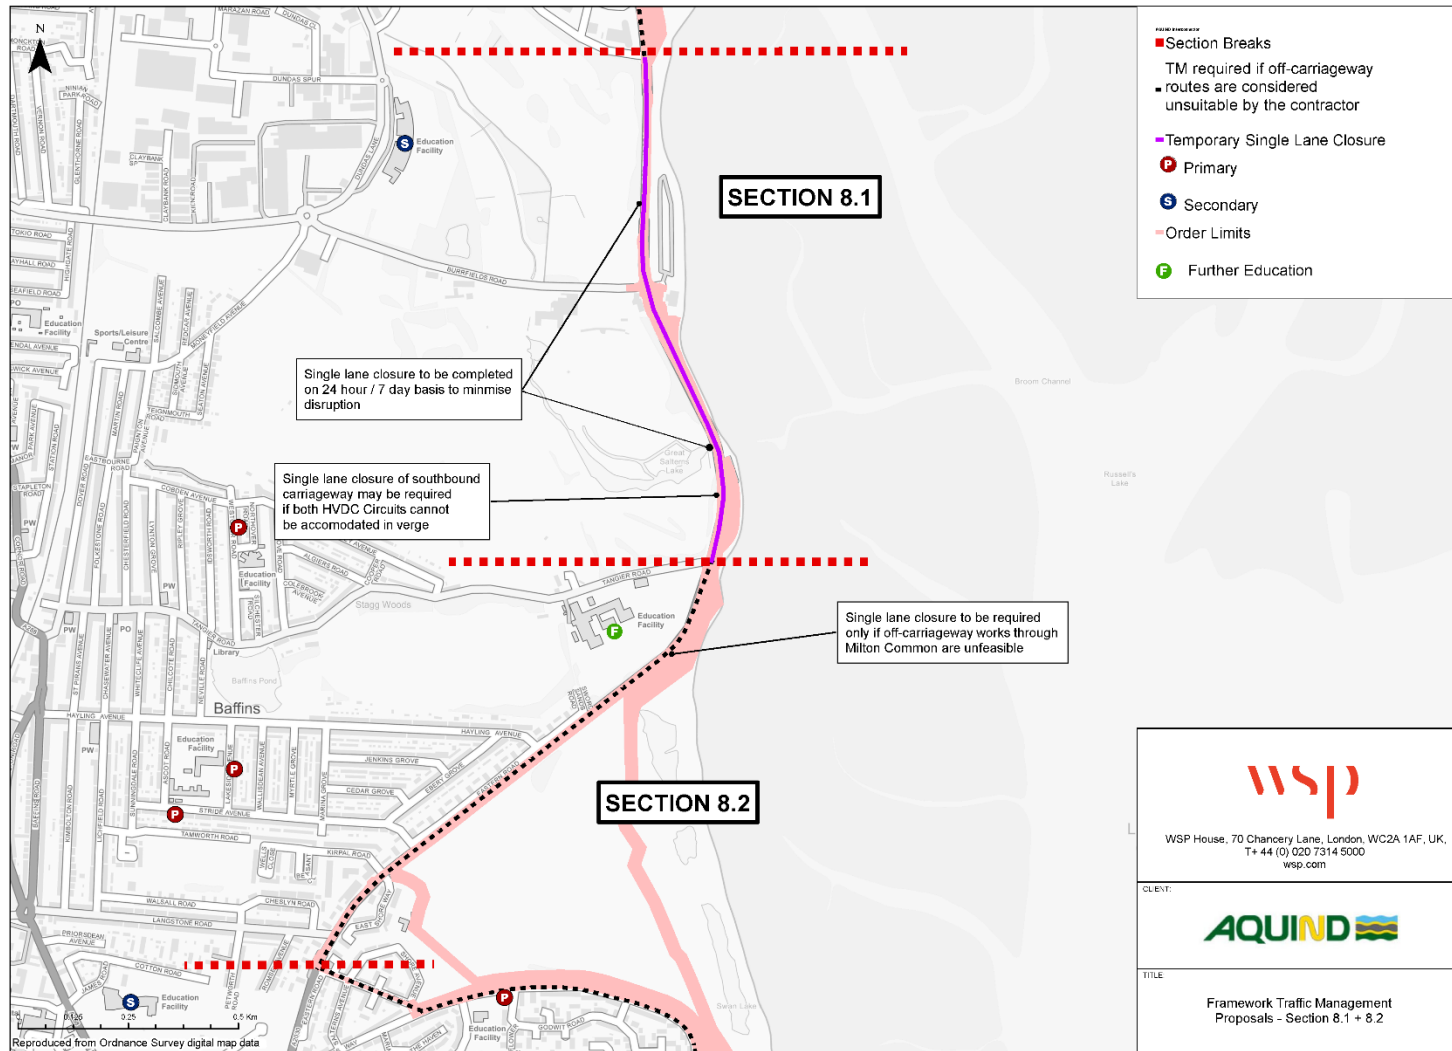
FTMS Plans for Section 8.1 and 8.2
